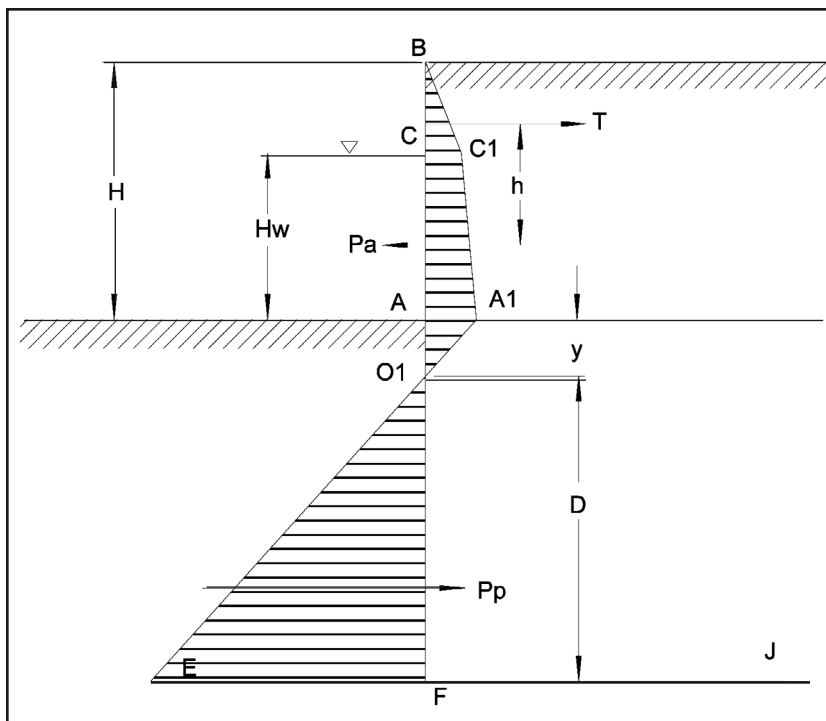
Anchored Sheet Pile Walls, Free Earth Support Method, Granular Soil
